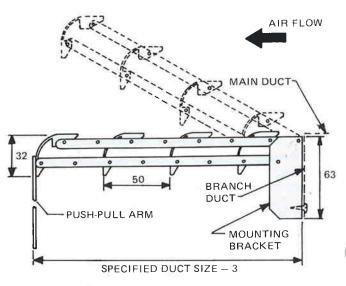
INSTALLATION OF DAMPER AT BRANCH TAKE-OFF
